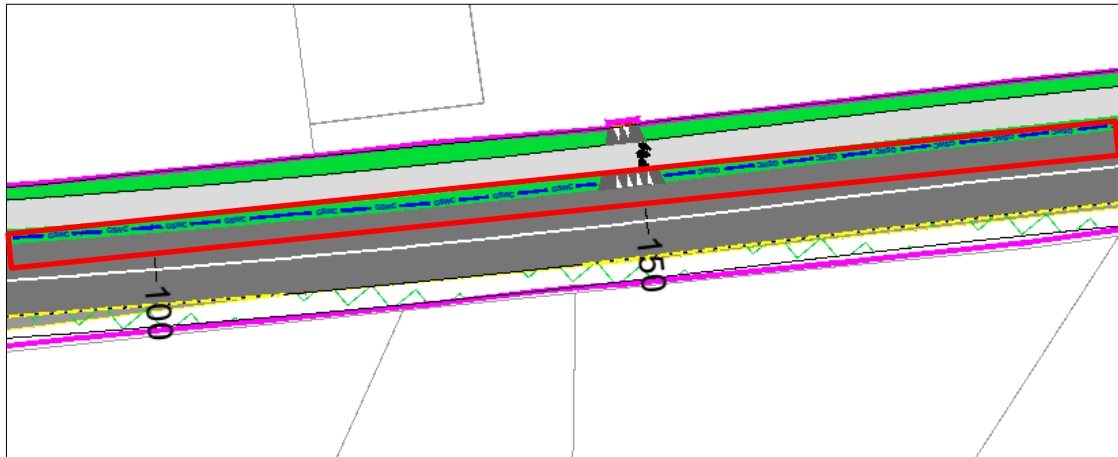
Road Marking Design (Drawing 11199-08-1010-B)
